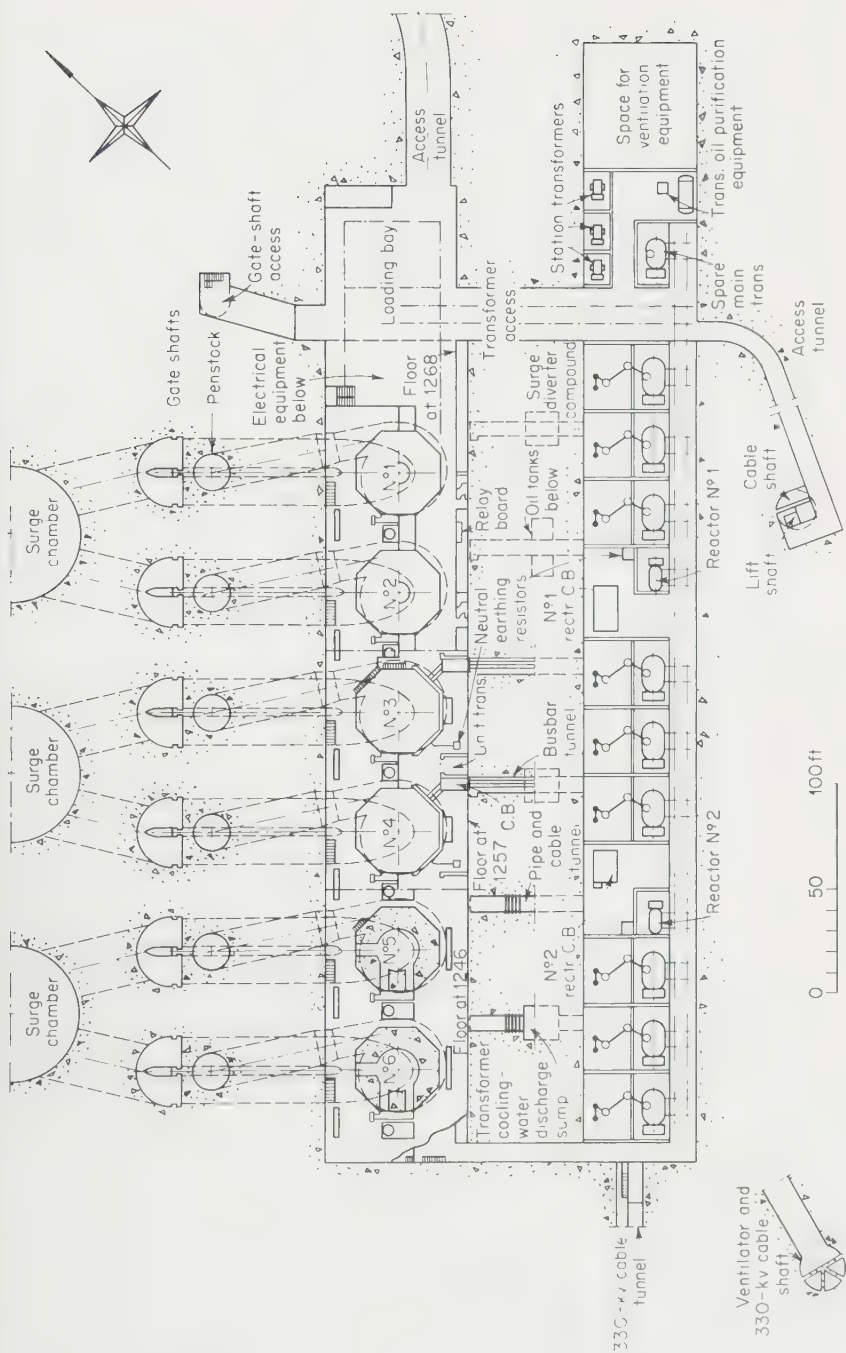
Kariba Gorge powerhouse, general plan of underground powerhouse.
